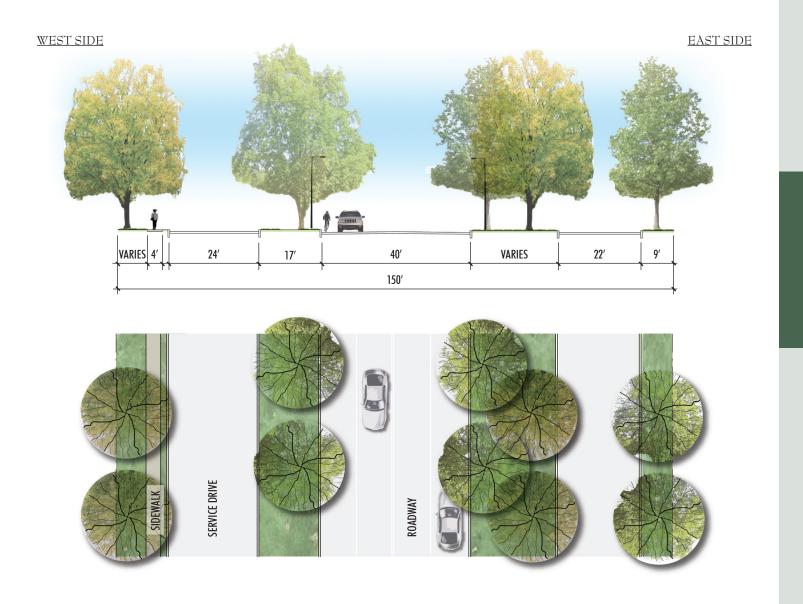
Southern Parkway: Zone 1, 4 & 5 Existing Conditions Section and Plan (with dual service drives)
